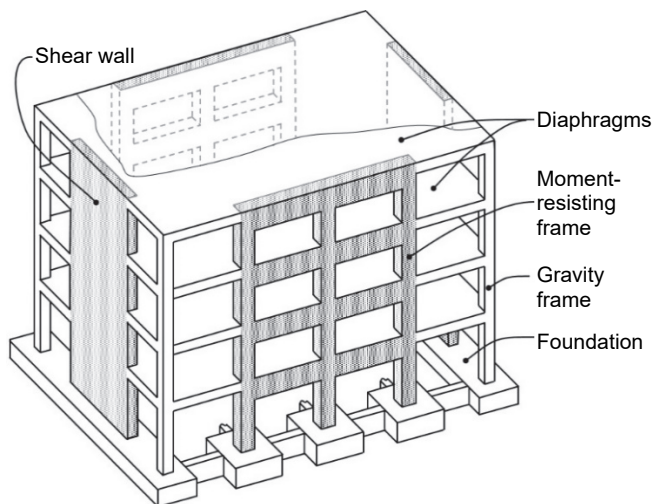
Isometric view of a basic building structural system comprising horizontal elements (diaphragms), vertical elements (walls and frames), and foundation.
